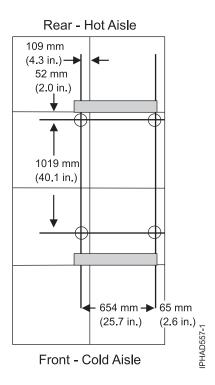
Single rack tiedown hole pattern. Raised floor with 610 mm (24 in.) floor panels figure
